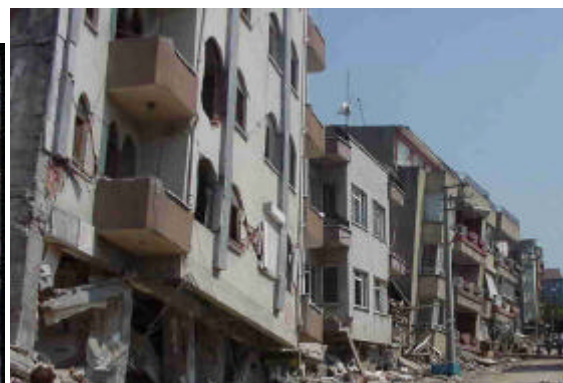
(left) Structural failure (soft storey) of a group of similar buildings
